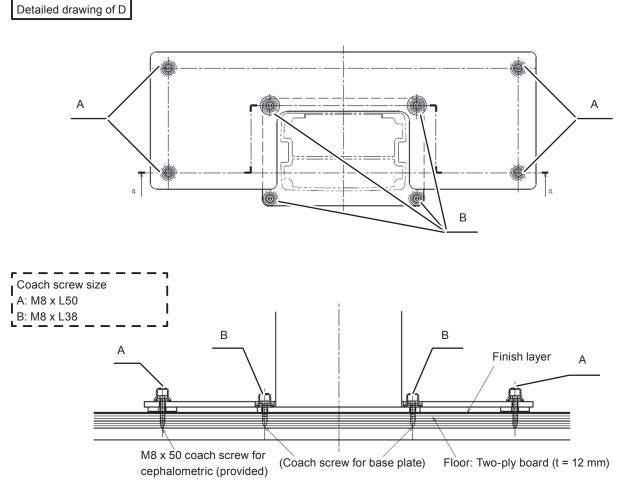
Floor fixing detail drawing D (Cephalometric type)
